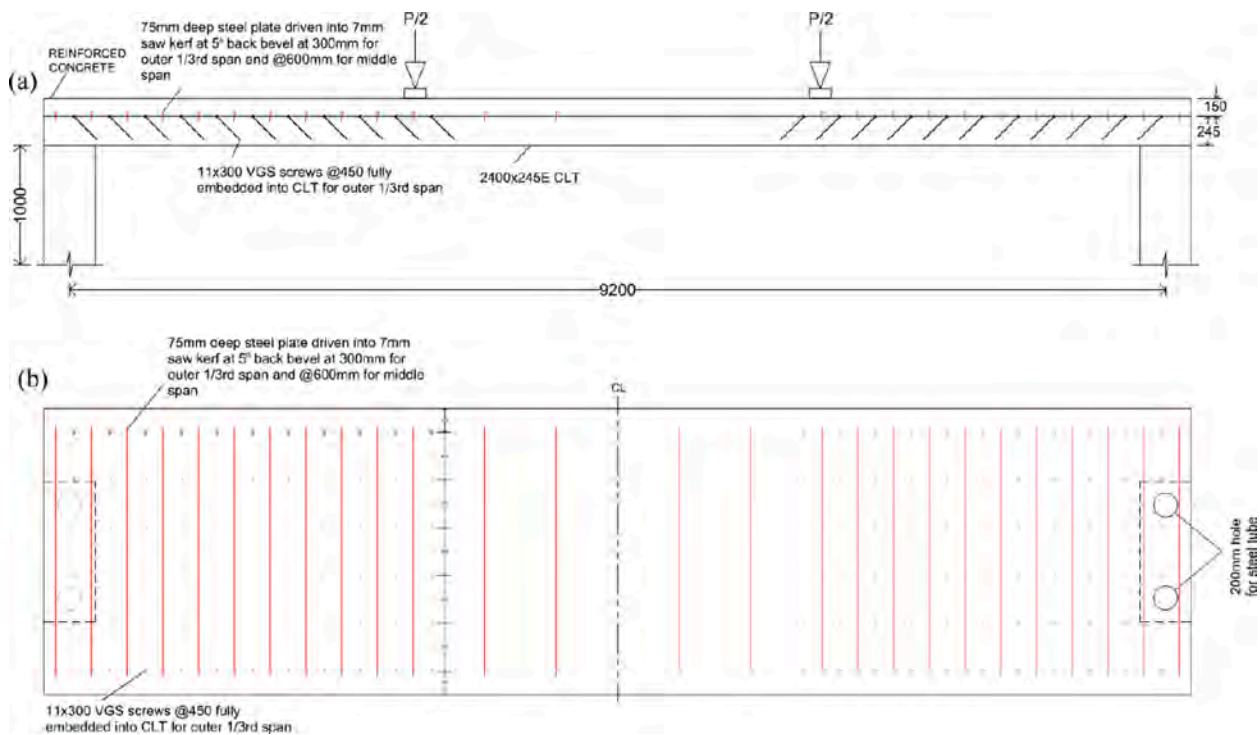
Full-scale TCC floor specimens - a) cross-section, b) plan.
